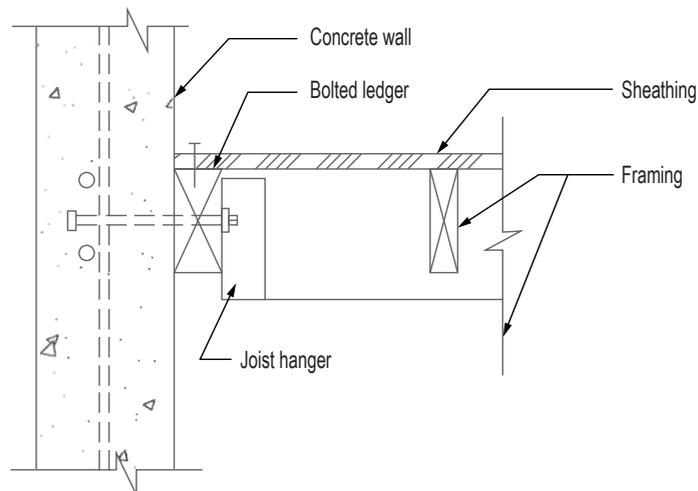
Inadequate concrete wall to wood light-frame diaphragm connection, lacking wall anchor capable of resisting direct tension.
